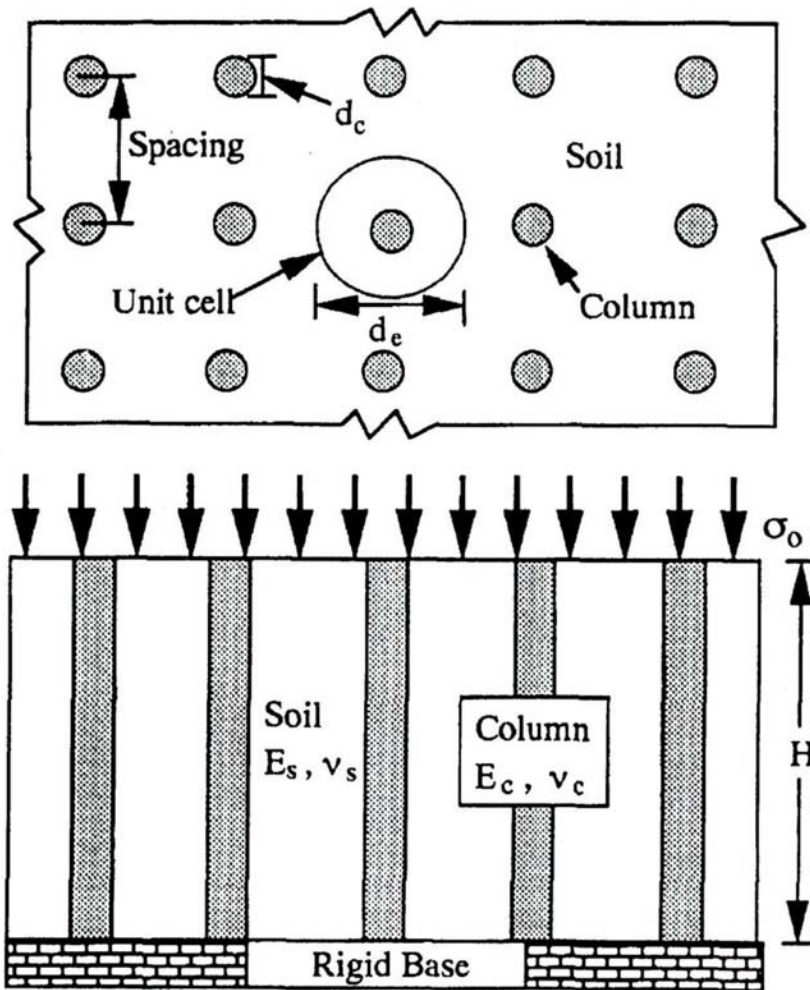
Foundation system on an improved ground (Alamgir et al., 1996)
